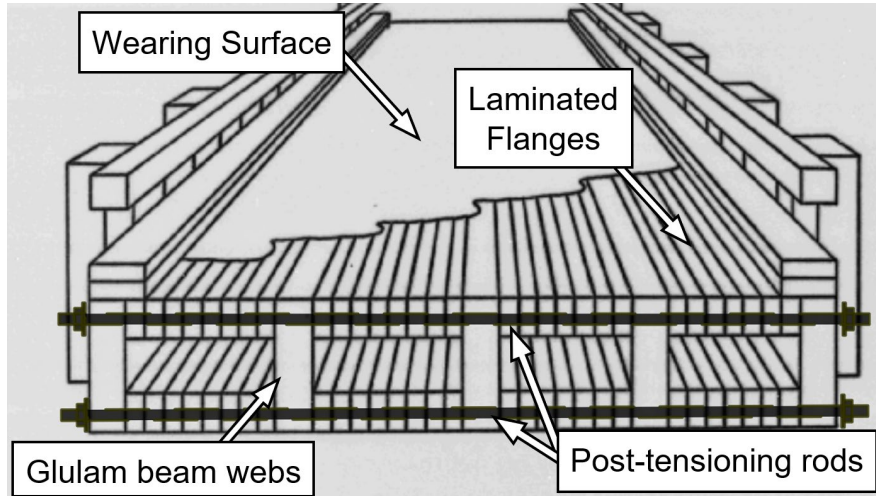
Typical Section of a Stress-Laminated Timber Box Beam
